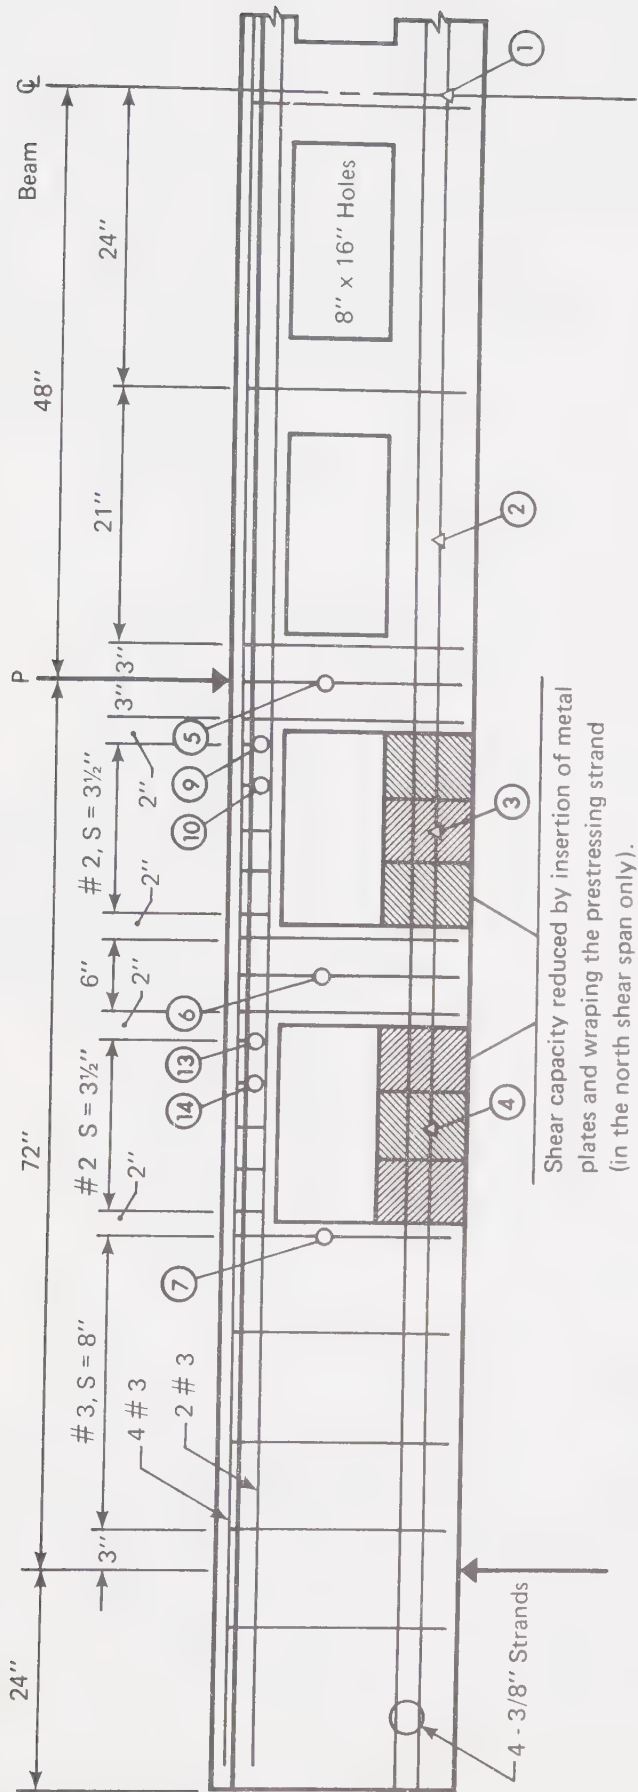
Reinforcement Details and Strain Gage Locations for Beam 4-16-6
